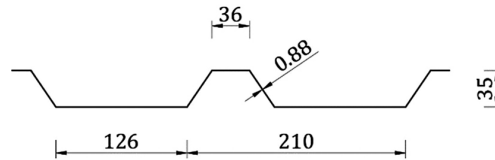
The geometry of the trapezoidal sheeting cross-section [mm]
